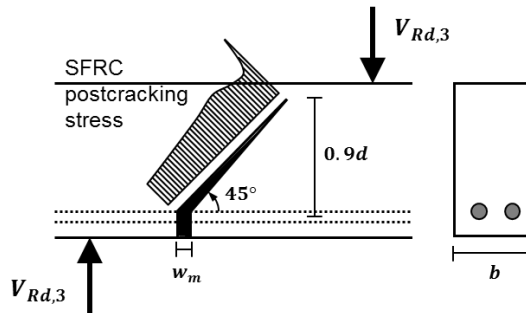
Assumed crack geometry in a beam with conventional longitudinal reinforcement loaded to the ultimate shear loading capacity, $V_{Rd,3}$. The crack is assumed to extended under 45° , and the crack opening at the rebar is limited to w_m
